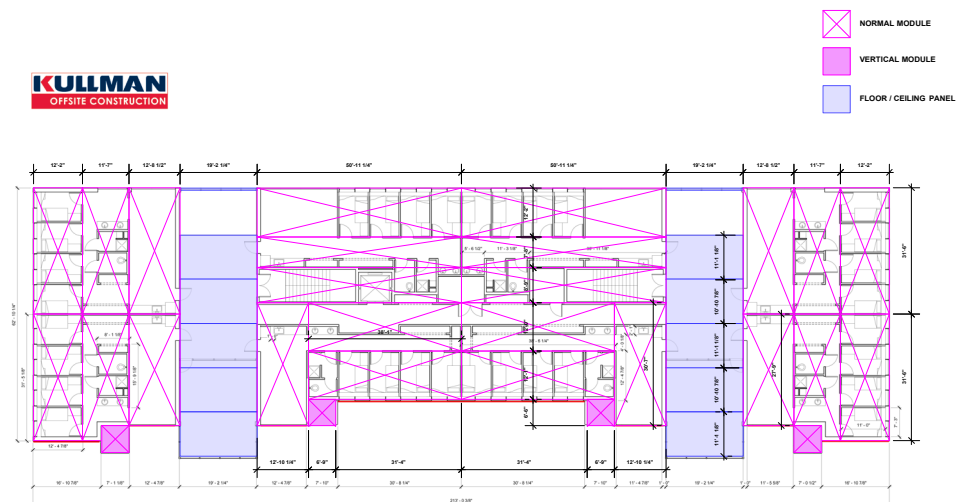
Building plan divided into shippable prefabricated modules. Modular division strategy courtesy of Kullman.
